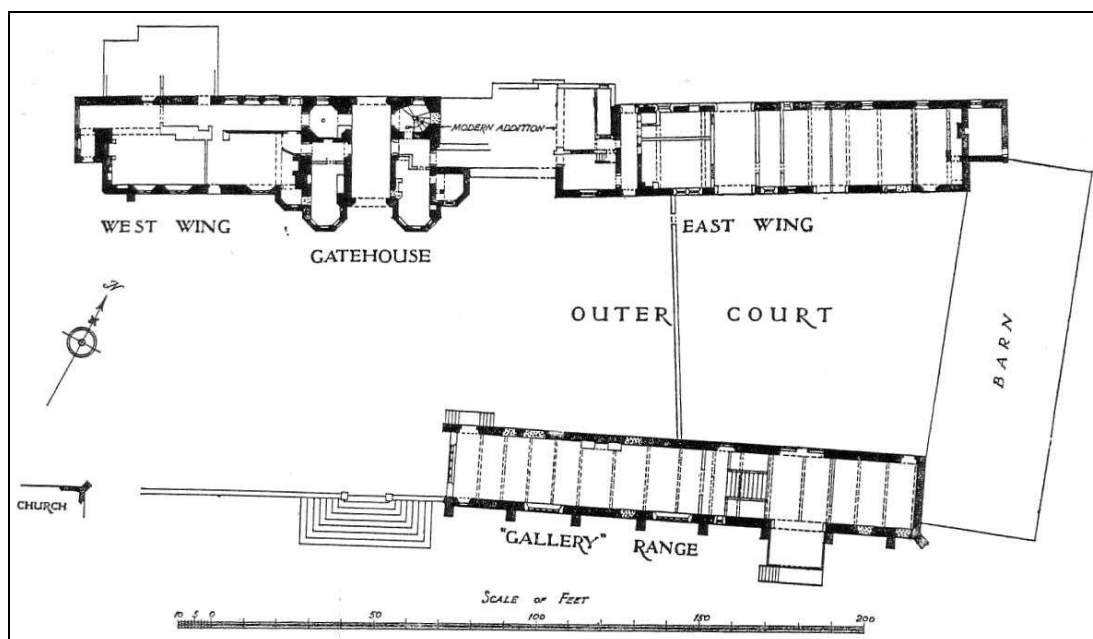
Plan showing the layout of the principal buildings at Layer Marney (RCHME, 1922, 159). Note that only the corner of the church is shown on this diagram.
